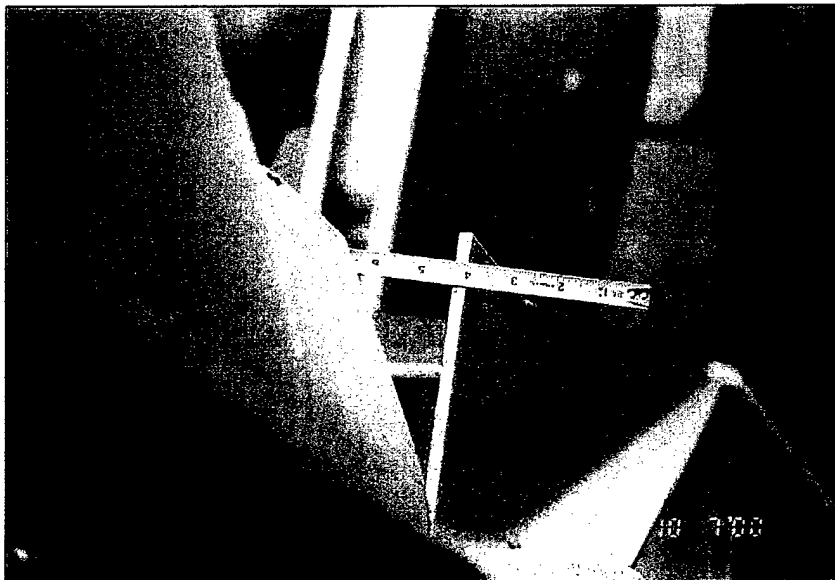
2 inch deflection in top right vertical bracing at middle girder.
